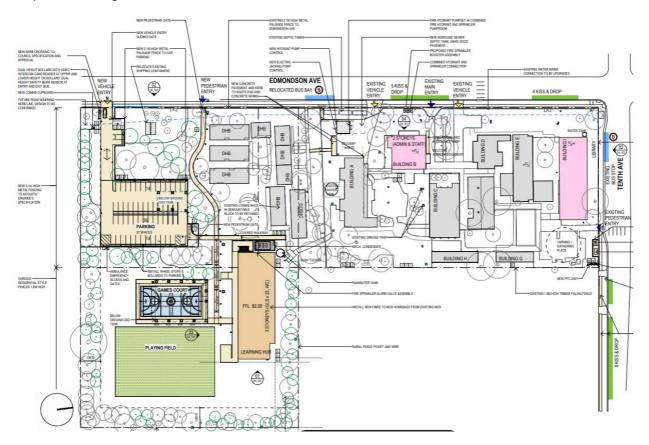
Site plan with proposed parking - accessible space indicated in hatched shading (Pedavoli Architects)
